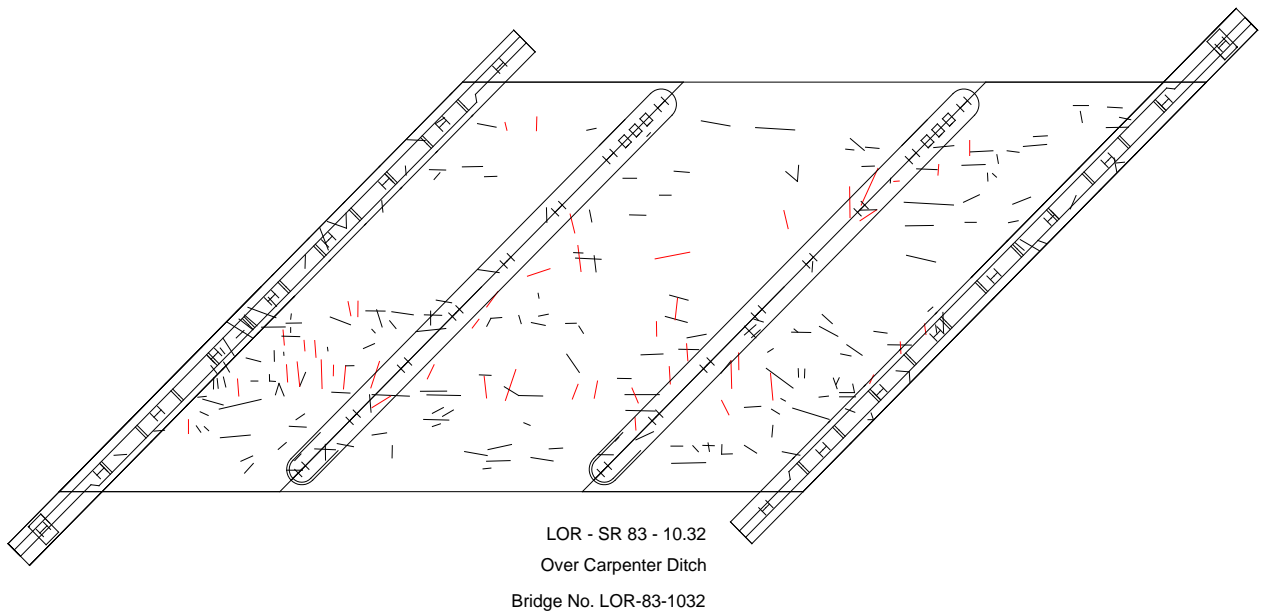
Crack map interposed with structural layout for Bridge Number LOR-83-1032
